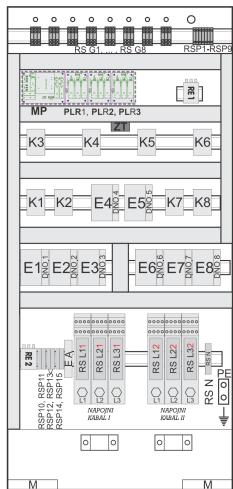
Example: Switchboard and top plate of vessel a boiler power 160kW
